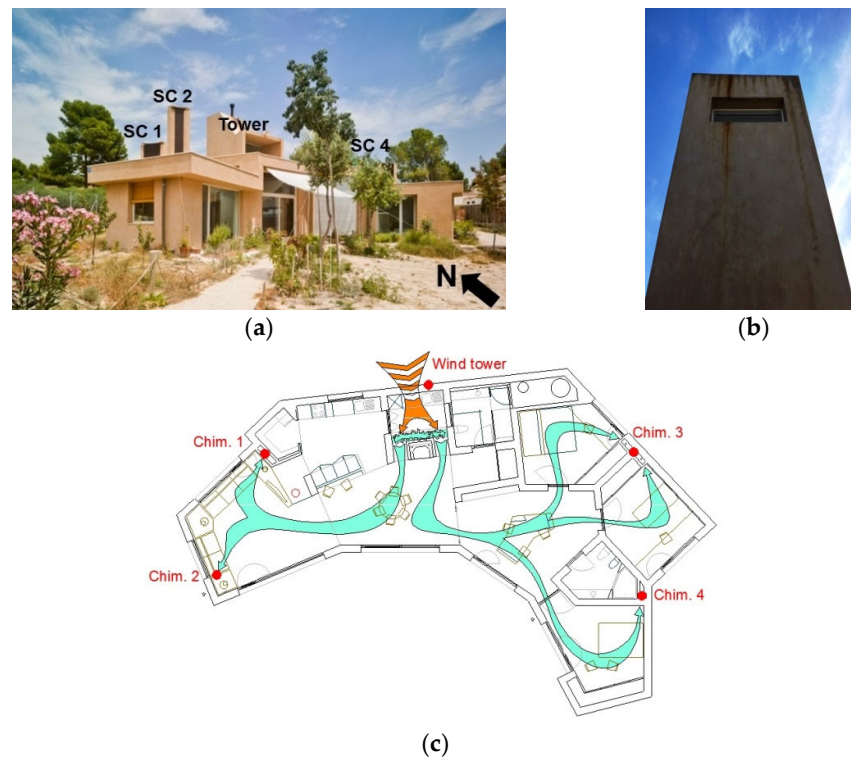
(a) Reference building; (b) Wind tower; (c) Building distribution.
